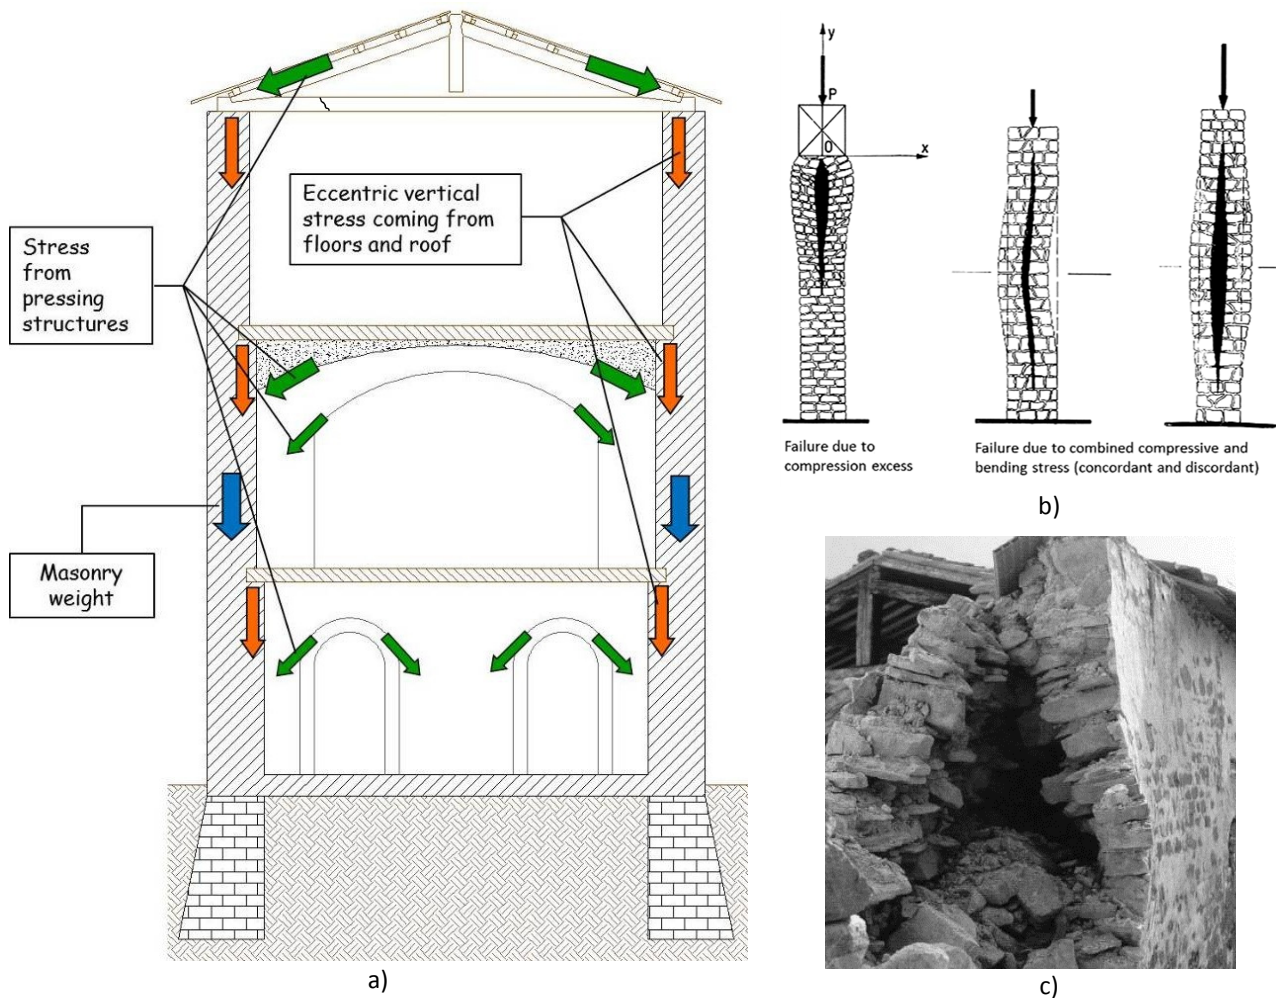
; Example of mechanical behaviour interpretation for an historical building according to the Mastrodicasa's layout: a) stress distribution in an ancient buildings composed by masonry structures, wooden floors, wooden roof and pressing structures like arches and vaults (author's draft); failure mechanisms for masonry walls (drafts from Mastrodicasa, "Dissesti statici delle strutture edilizie", 1943, elaborated by the author); c) example of vertical division between masonry layers due to lack of connections (picture taken from F. Doglioni and P. Mazzotti, "Codice di Pratica per gli interventi di miglioramento sismico nel restauro del patrimonio architettonico", Regione Marche, 2007, p. 109. (Doglioni F. M., 2007)
